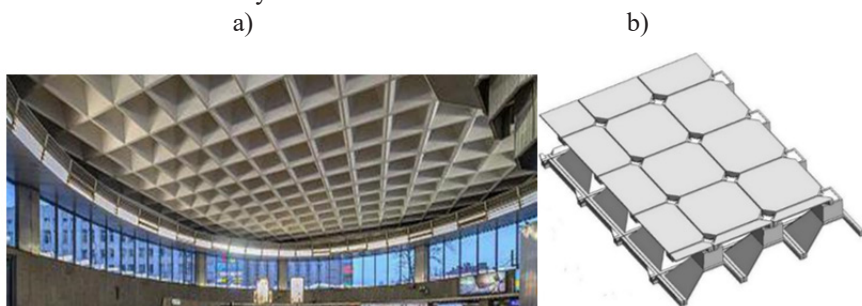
Structural pavement made of reinforced concrete elements: a) pavement of the Proletarskaya metro station lobby in St. Petersburg; b) BIM model of the pavement structure
